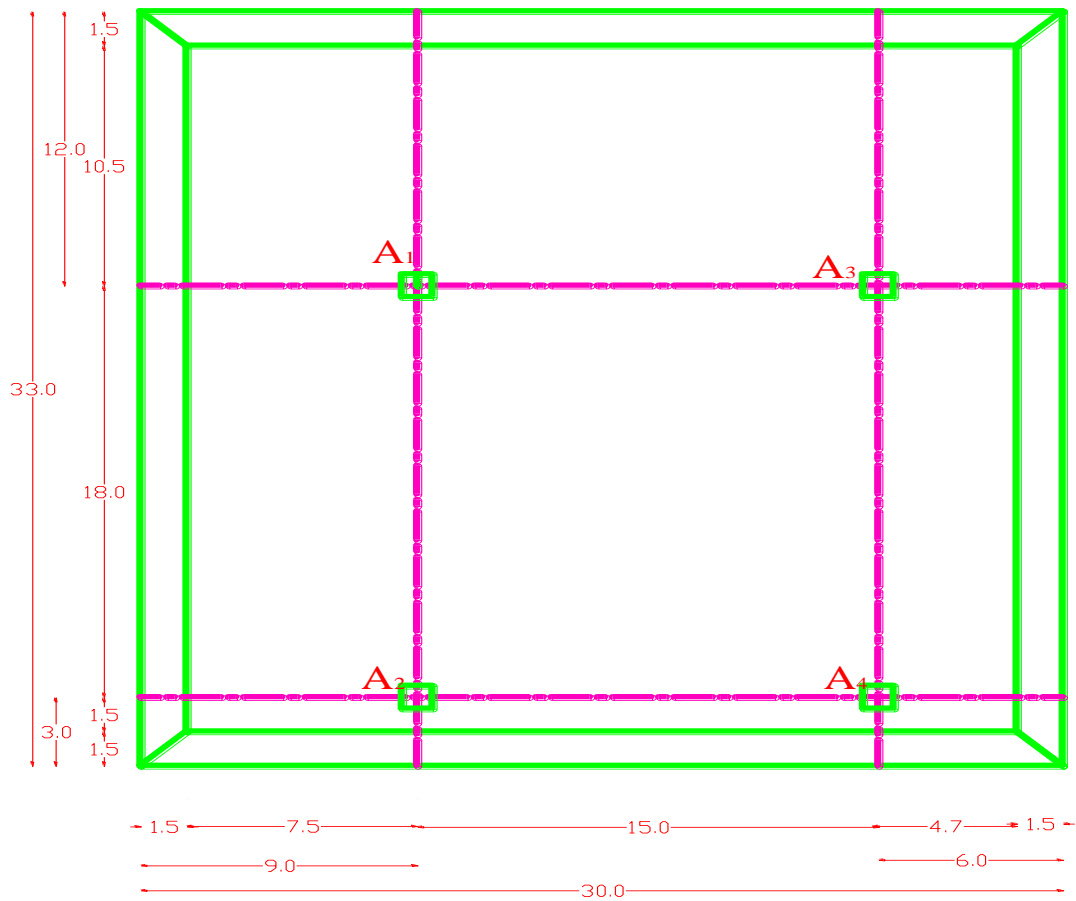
AutoCAD drawing for Shelter-A roof plan
